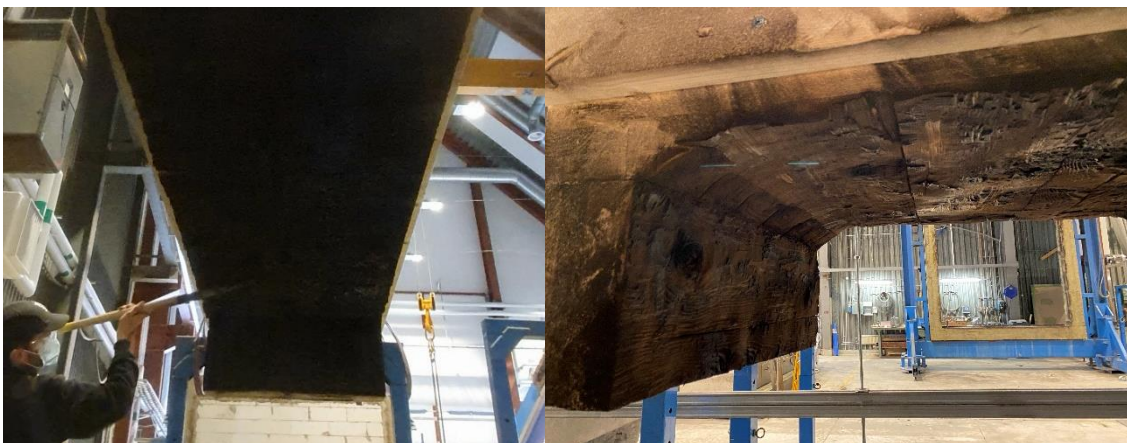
Removal of the char with a long-handled scraper (left) and surface after char removal (right)
